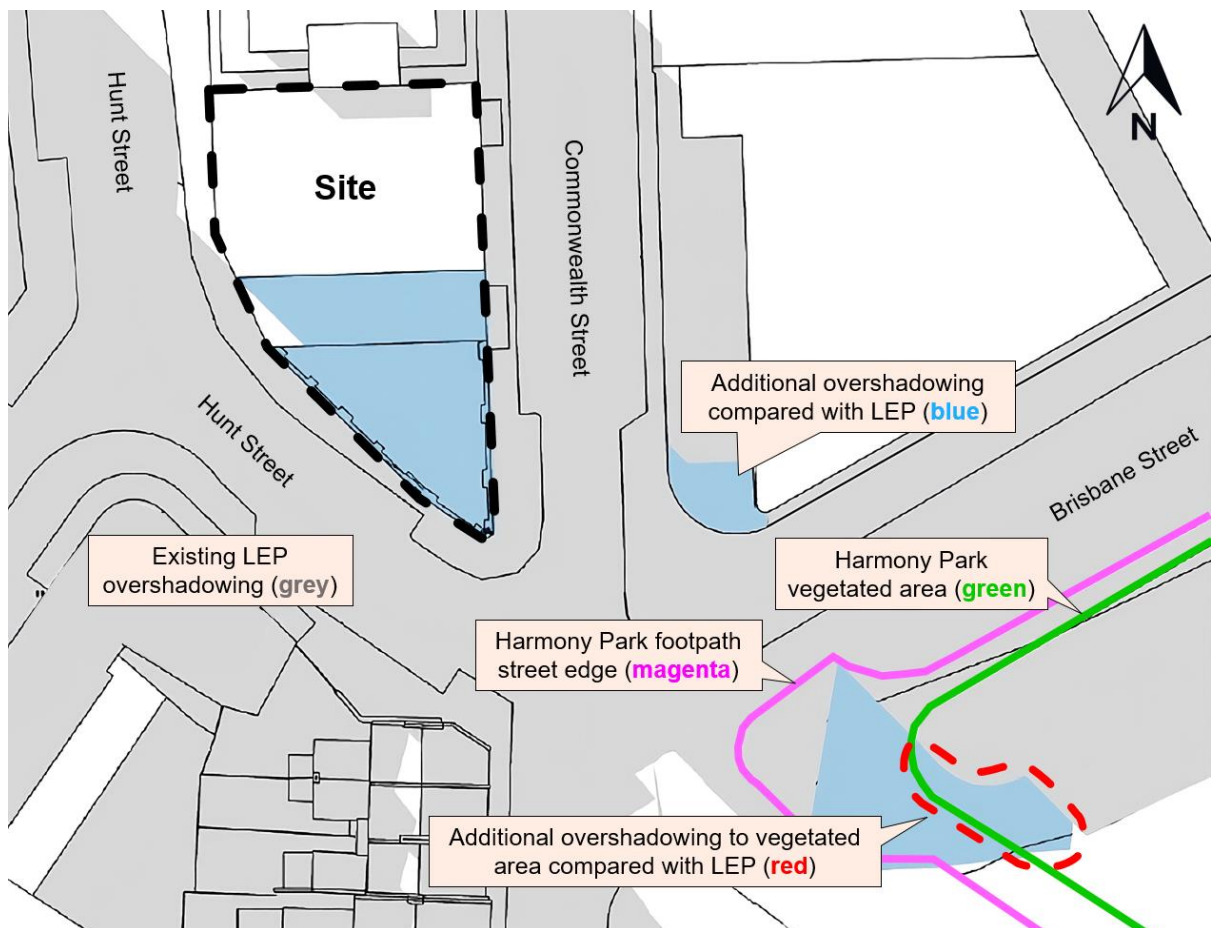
An indicative plan showing the envelope's additional overshadowing impact on Harmony Park at 3pm on June 21
